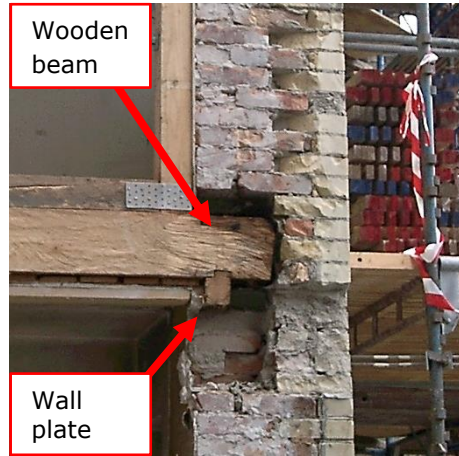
Facade/wooden beam interaction, 1st floor (2 bricks) --> 2nd floor (2 bricks).
